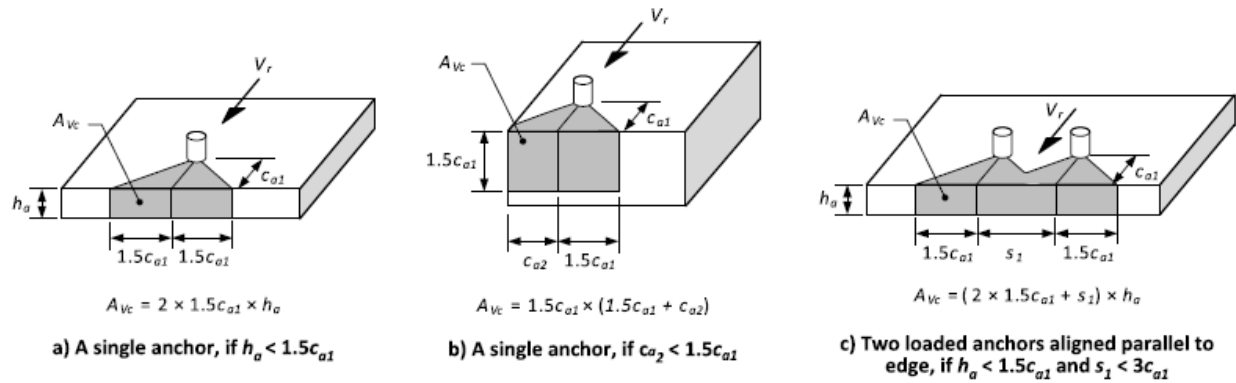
Concrete breakout failure area of single anchor and anchor group in shear (CSA 2019)
